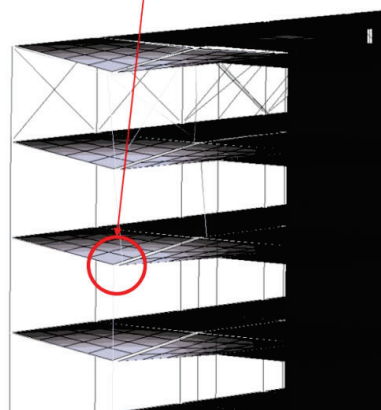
Scenario 2 of design option 2 @0.4 s, column connection shear failure
